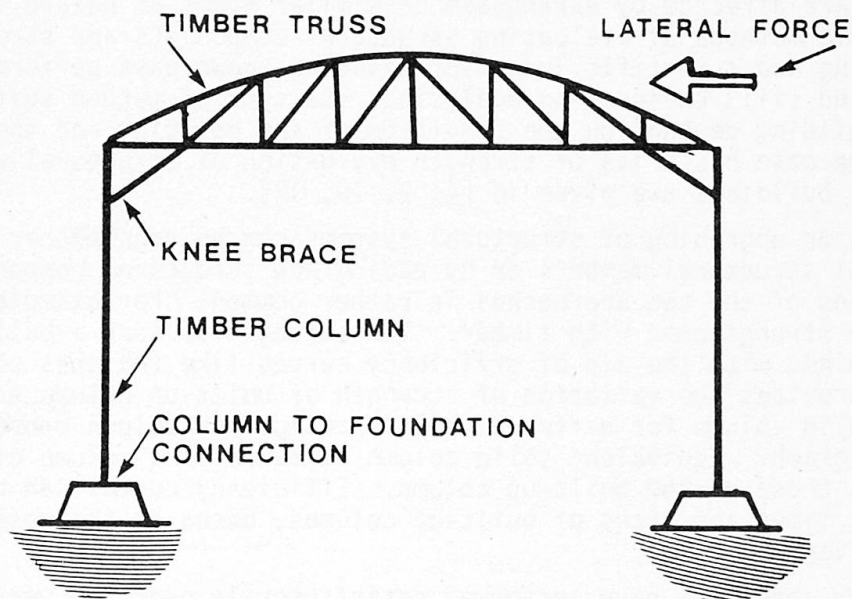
Knee-Braced Truss Bent - A Structural System to Resist Lateral Forces
